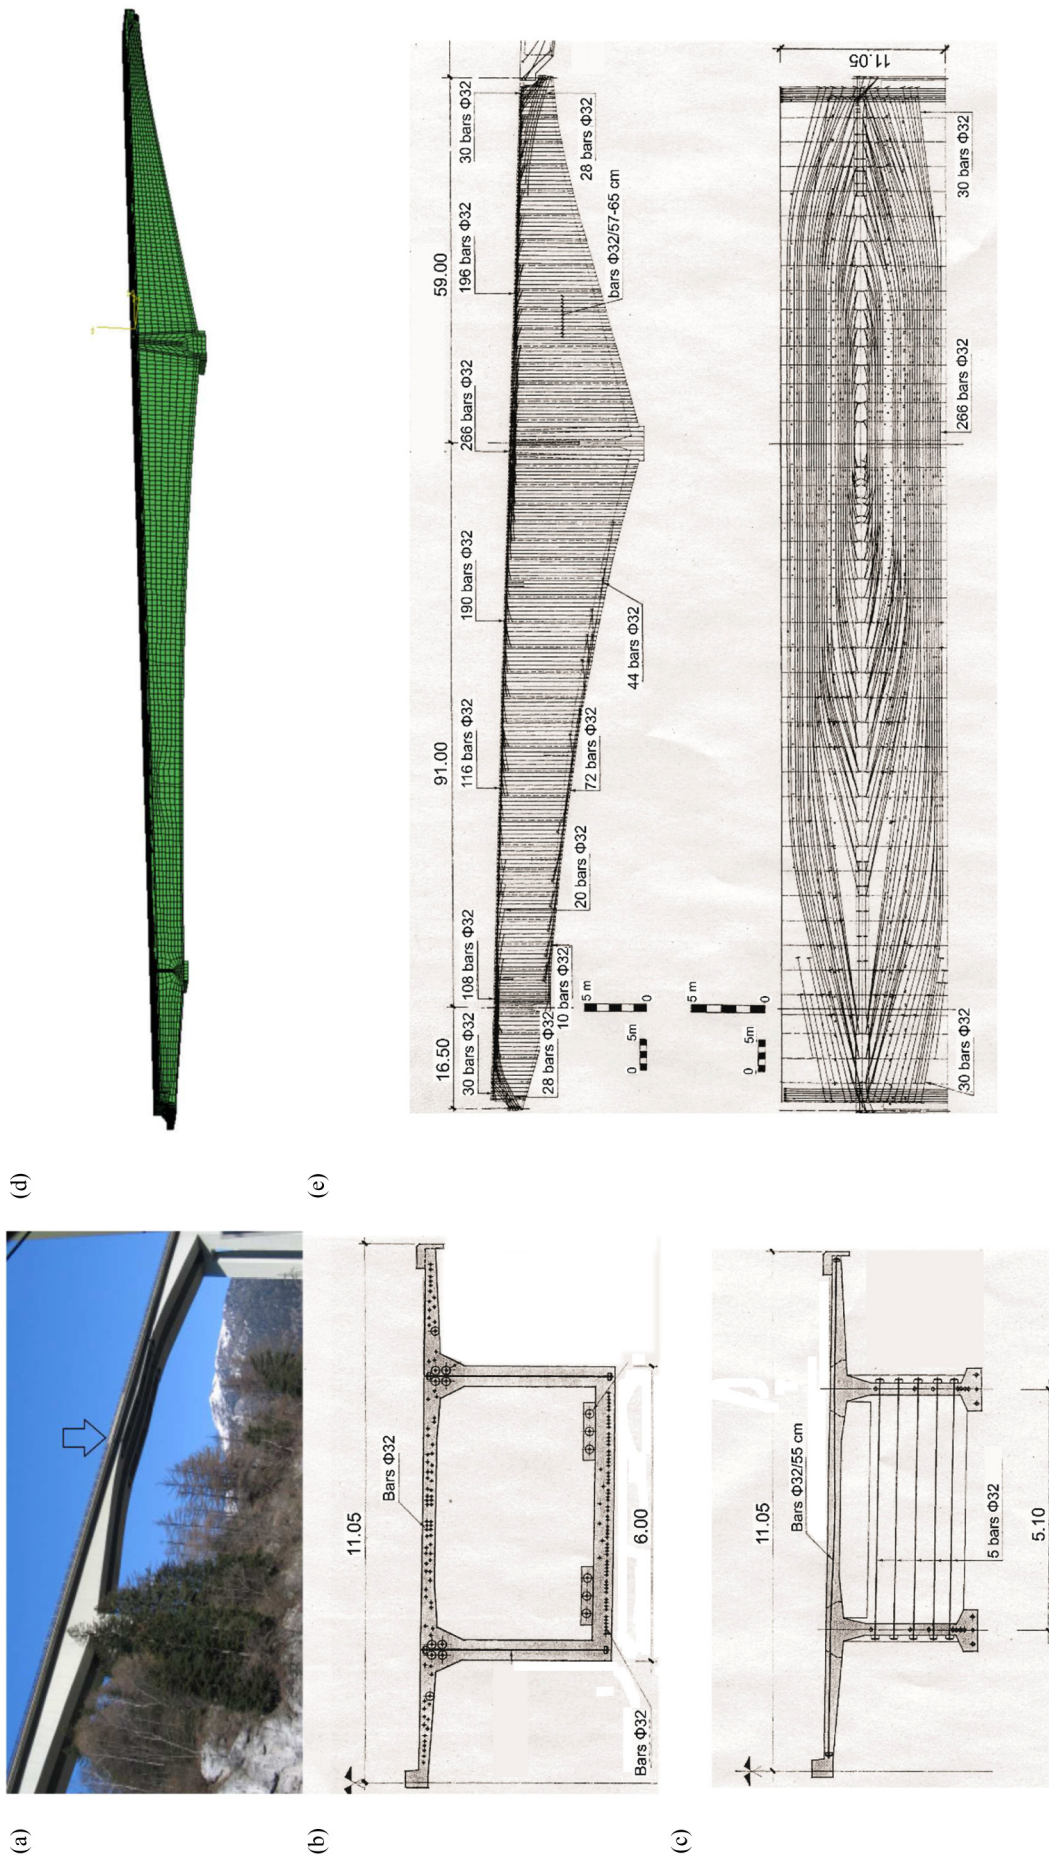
Colle Isarco Viaduct: (a) Bottom view of the bridge structure, (b) and (c) cross section and its prestressing layout, and (d) ABAQUS Finite Element Model using solid elements, and (e) pre-stressing layout in vertical and longitudinal direction
